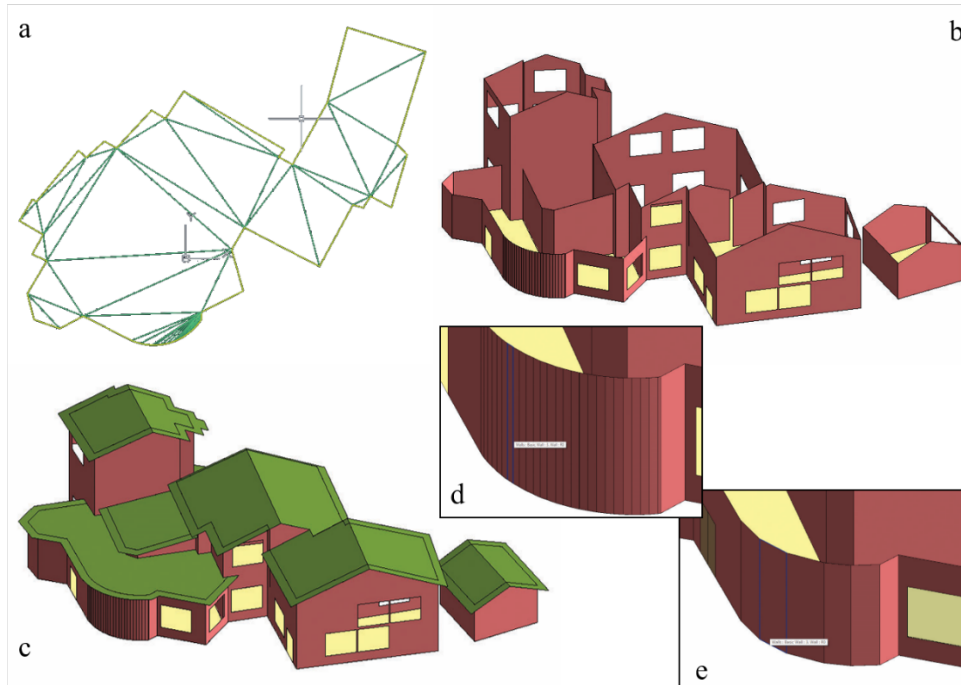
Modeling steps of geo-specific building from Figure 1, right. Step a: Building footprint imported in Revit. b: Walls and façade elements erected over the roof plane, c: formation of the roof structure with orientation to the dominant roof planes, d-e: optional simplification of building.
